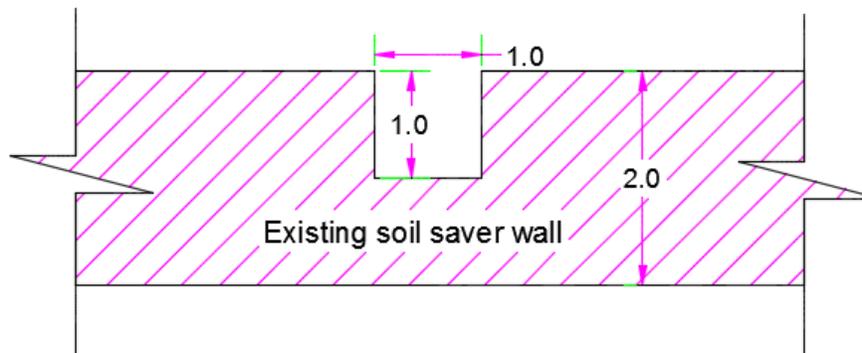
Schematic Front View of Square Notch Soil Saver Wall
